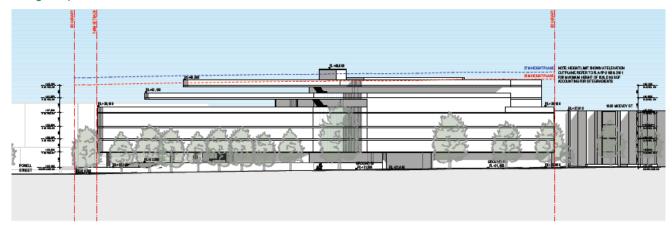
Young Street elevation. Source: Plus Architecture Urban Design Report
